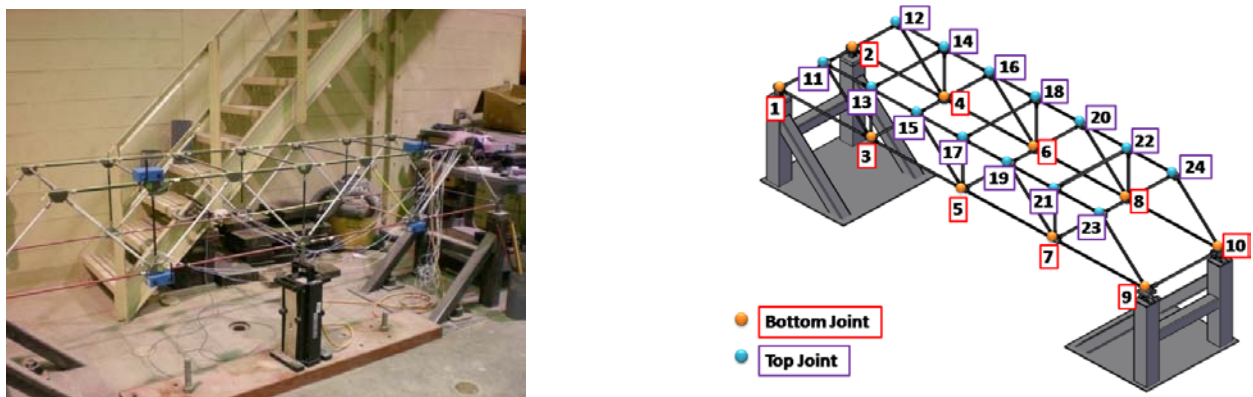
Truss bridge network validation test setup with four nodes (left) and rendering of truss bridge with joint IDs used for network validation (right).
